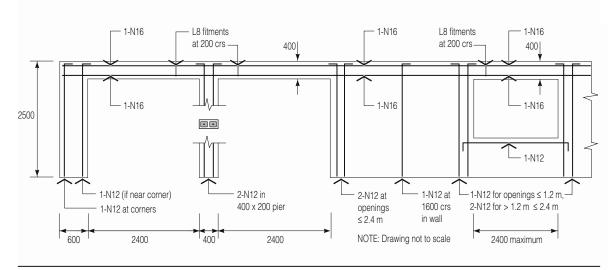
Wall Reinforcement for 190-mm Leaf for Wind Classifications N5 and C2 and 2500-mm Wall Height
